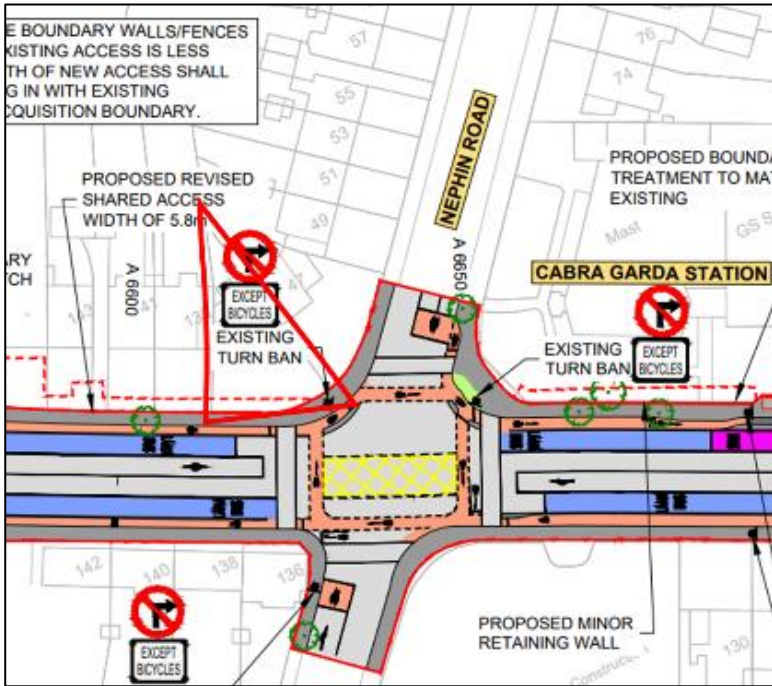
Proposed new Layout at 137 Navan Road
